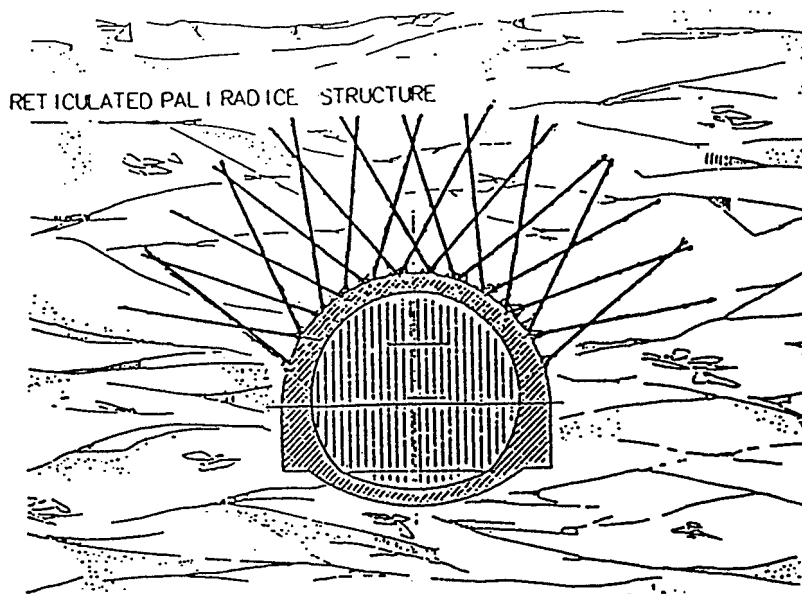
Scheme of reinforcement of an existing tunnel (Lizzi, 1994). [Note: Reinforcements are inclined in three dimensions.]
